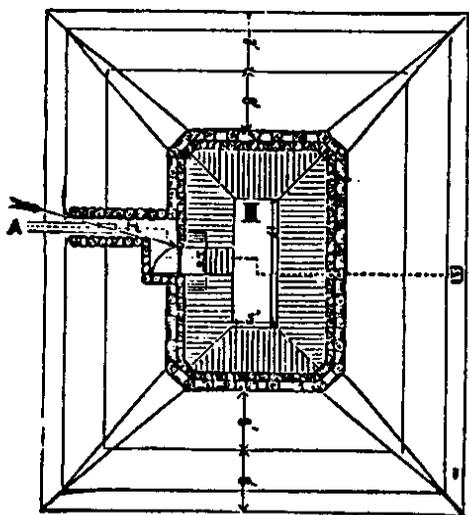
PLAN OF RECTANGULAR BLOCK-HOUSE.
